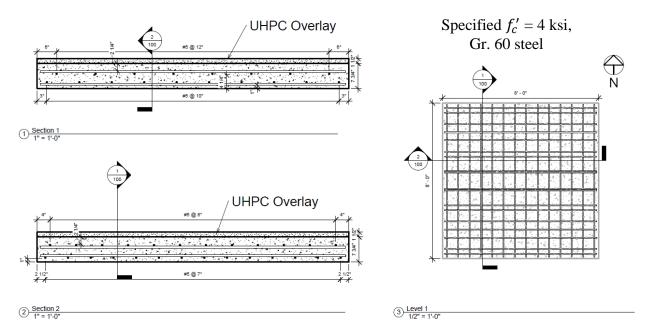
Plan and section views of the concrete slabs with UHPC overlay
